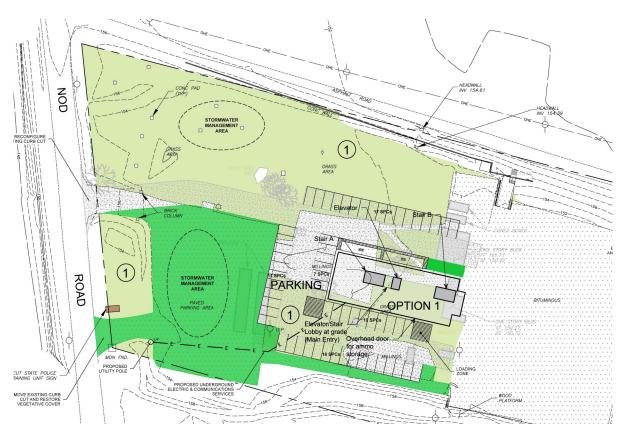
Pre-Design Building Option 1 - Partial Site Plan
